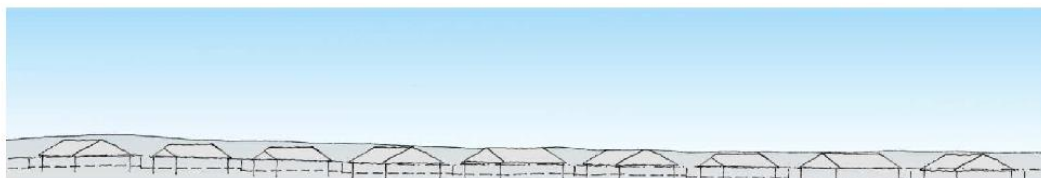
Indicative Earth Mound Elevation (Transparent)
